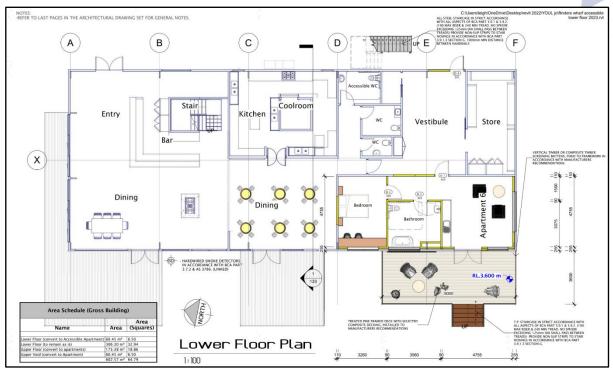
Proposed reconfiguration of the proposed building, lower floor plan.
